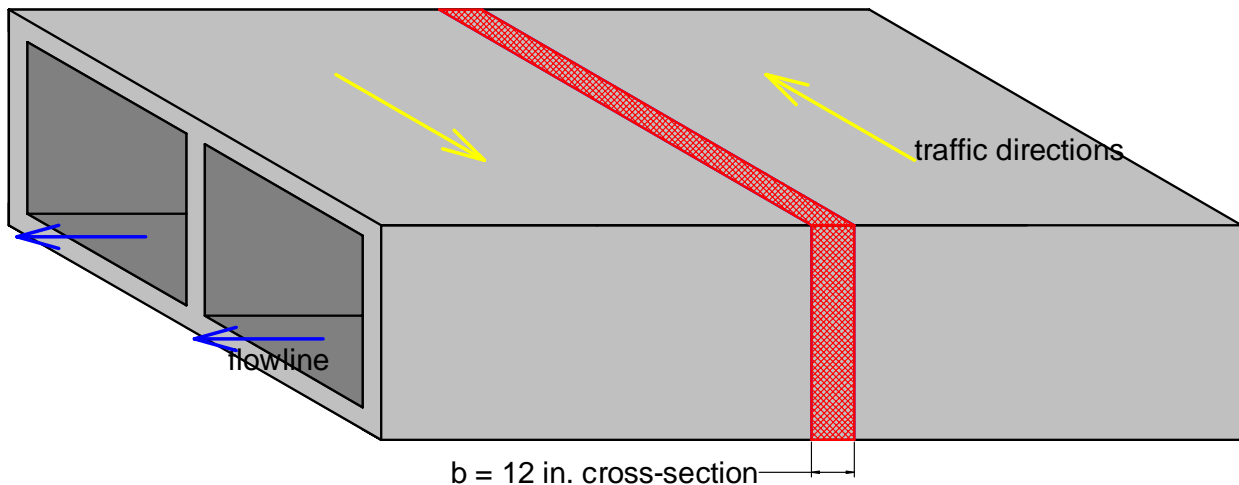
THREE DIMENSIONAL VIEW OF A CULVERT INDICATING TWO DIMENSIONAL STRIP.
